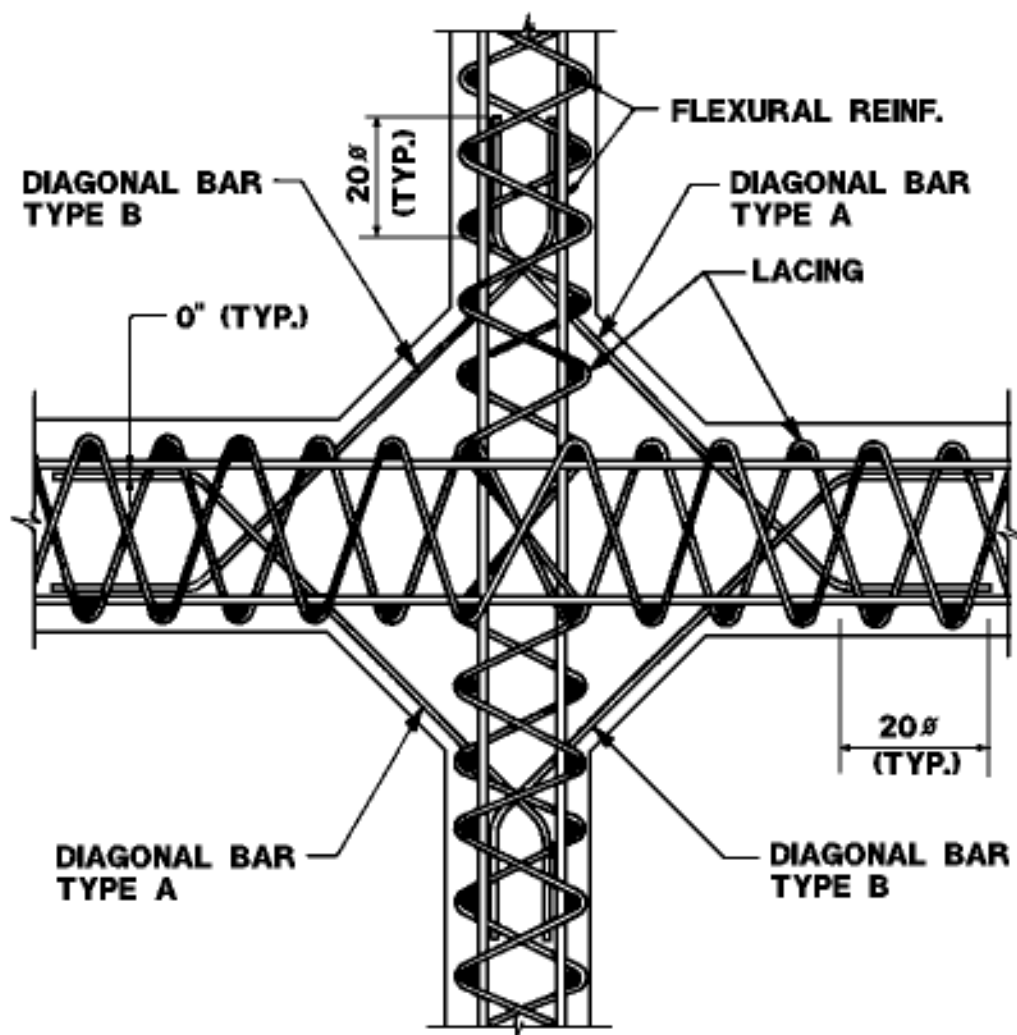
Typical Detail at Intersection of Continuous and Discontinuous Laced Walls
